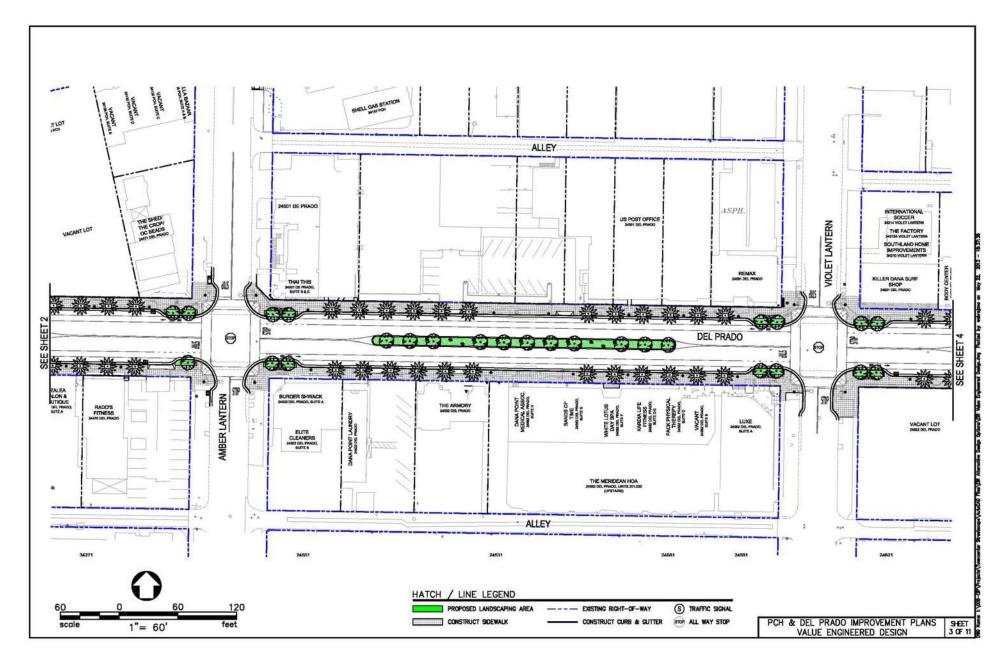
Del Prado Avenue - Amber Lantern to Violet Lantern
